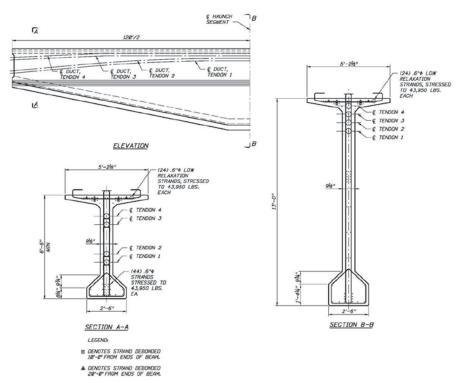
Elevation and cross section of the drop-in girder (1'=0.305 m, 1"=25.4 mm)
